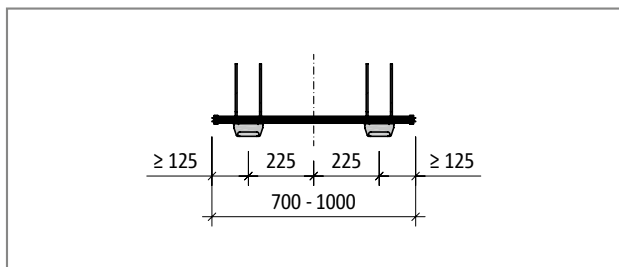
Schöck Tronsole® type T-V2-H...-L700 to L1000: Product layout
